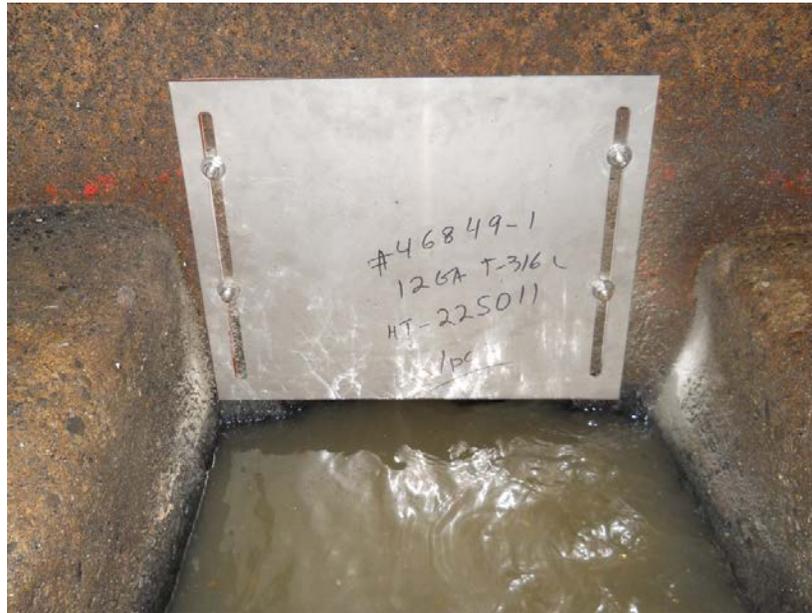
Orifice Plate installed over 12-inch pipe in Basin 49
